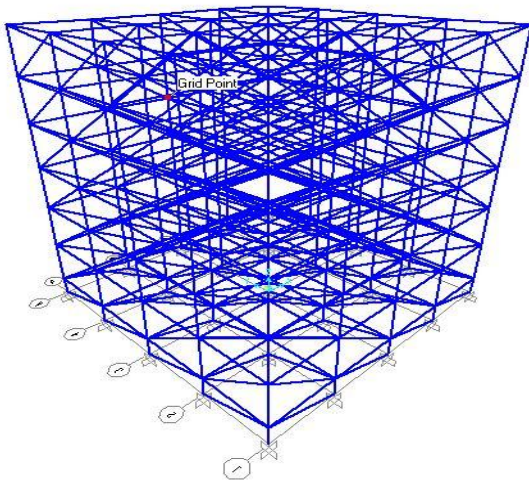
3D-view of G+5 storeys Single - Strut Model Building
